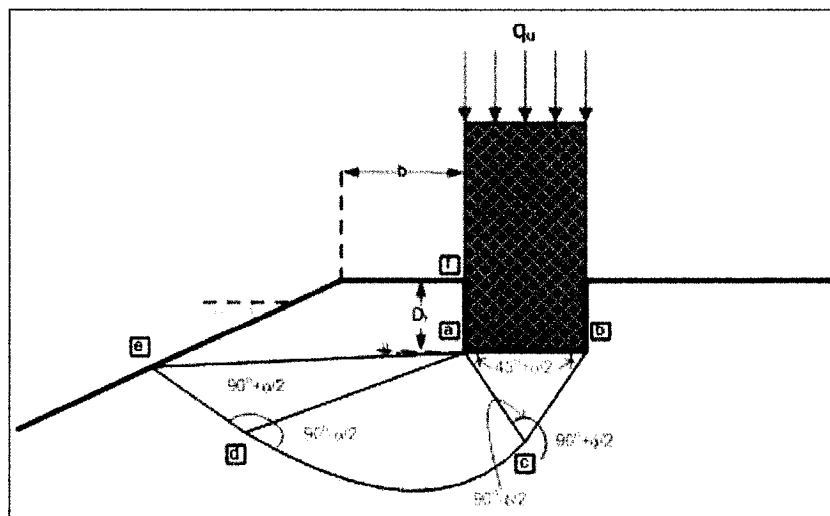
Failure plane, Meyerhof's Theory for shallow foundation near slope (1957).
